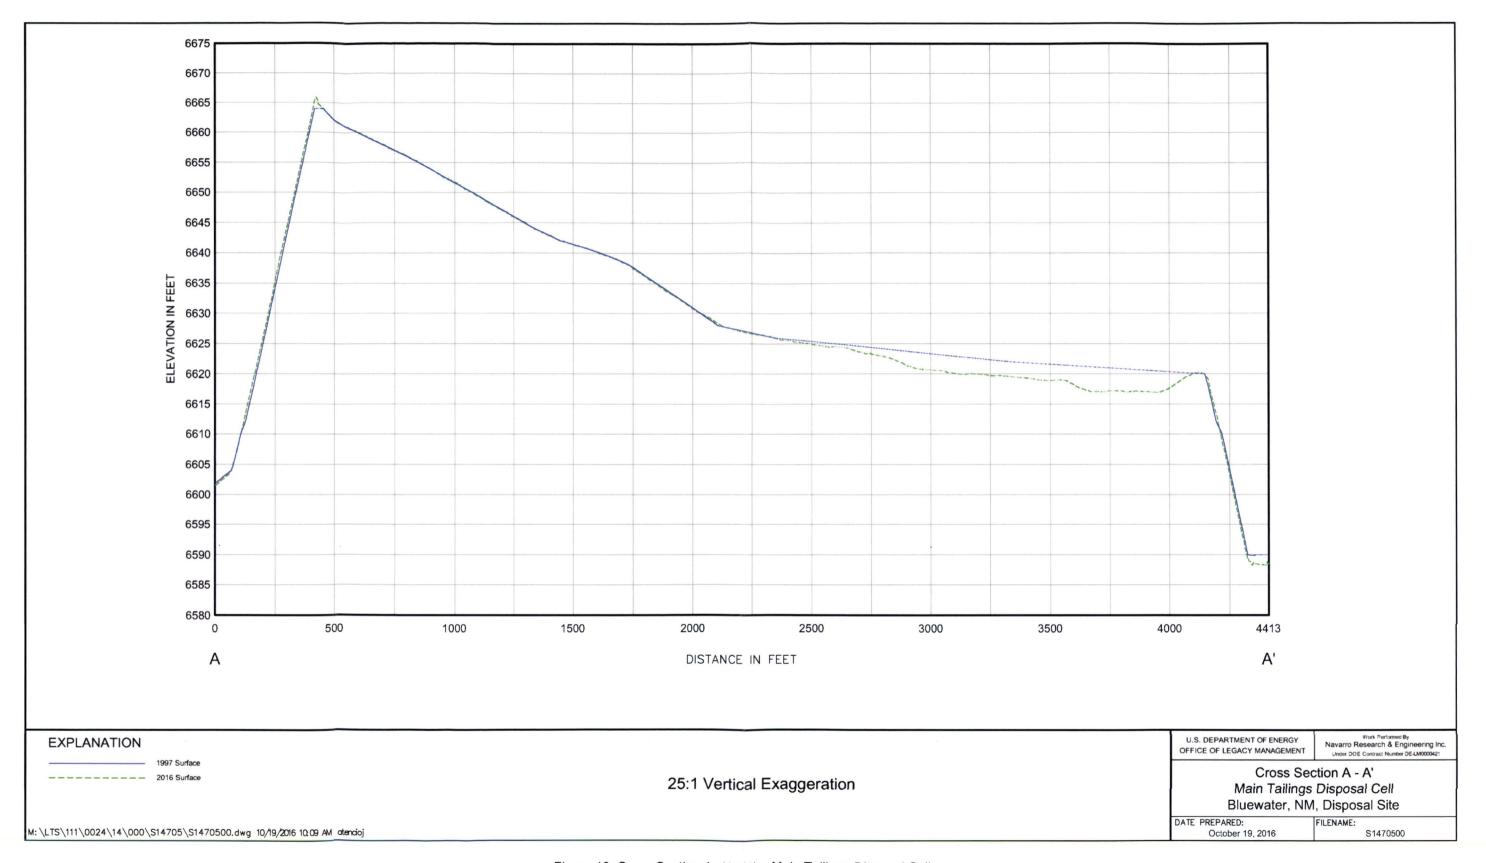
Cross Section A-A' of the Main Tailings Disposal Cell
